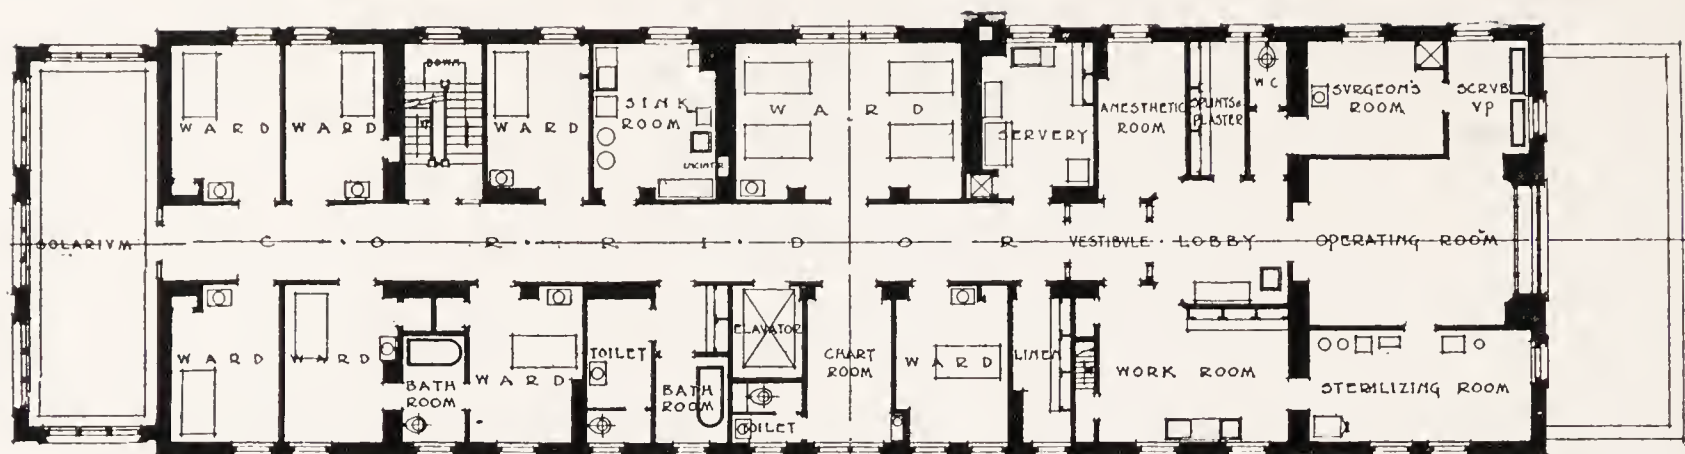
SECOND FLOOR PLAN, ST. JOSEPH'S HOSPITAL, HAMILTON, ONT.
